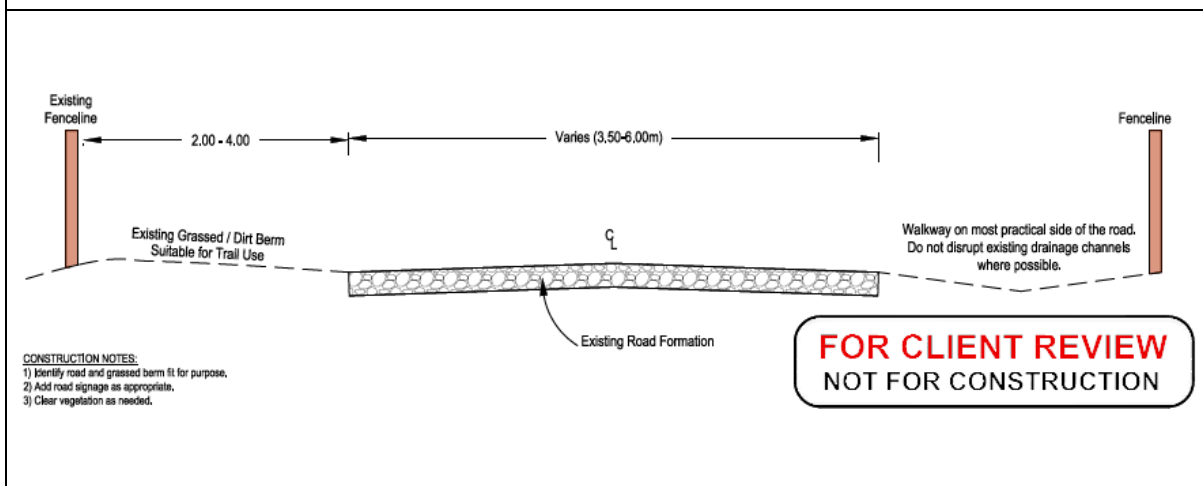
Typical Trail Cross-section 12: Existing local road fit for purpose
